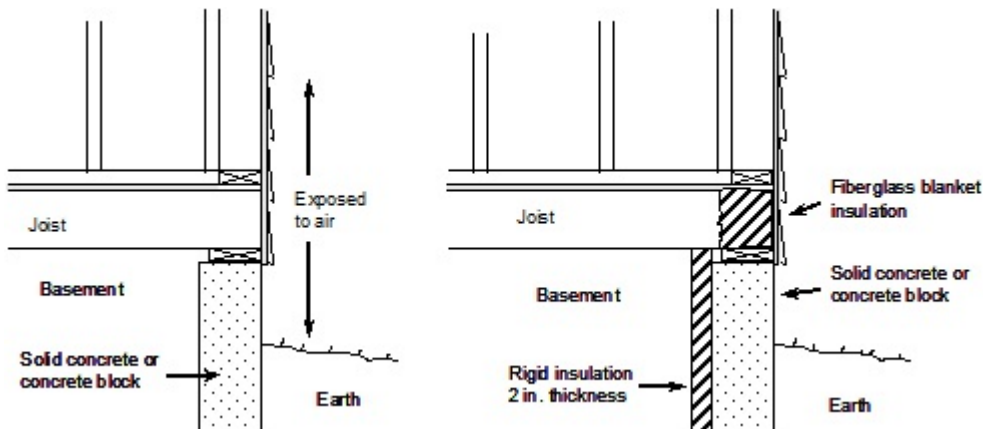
Uninsulated basement walls, especially above grade level, can contribute to a significant loss of heat from a building. An area easy to insulate and often omitted is the joist space above the basement wall.
